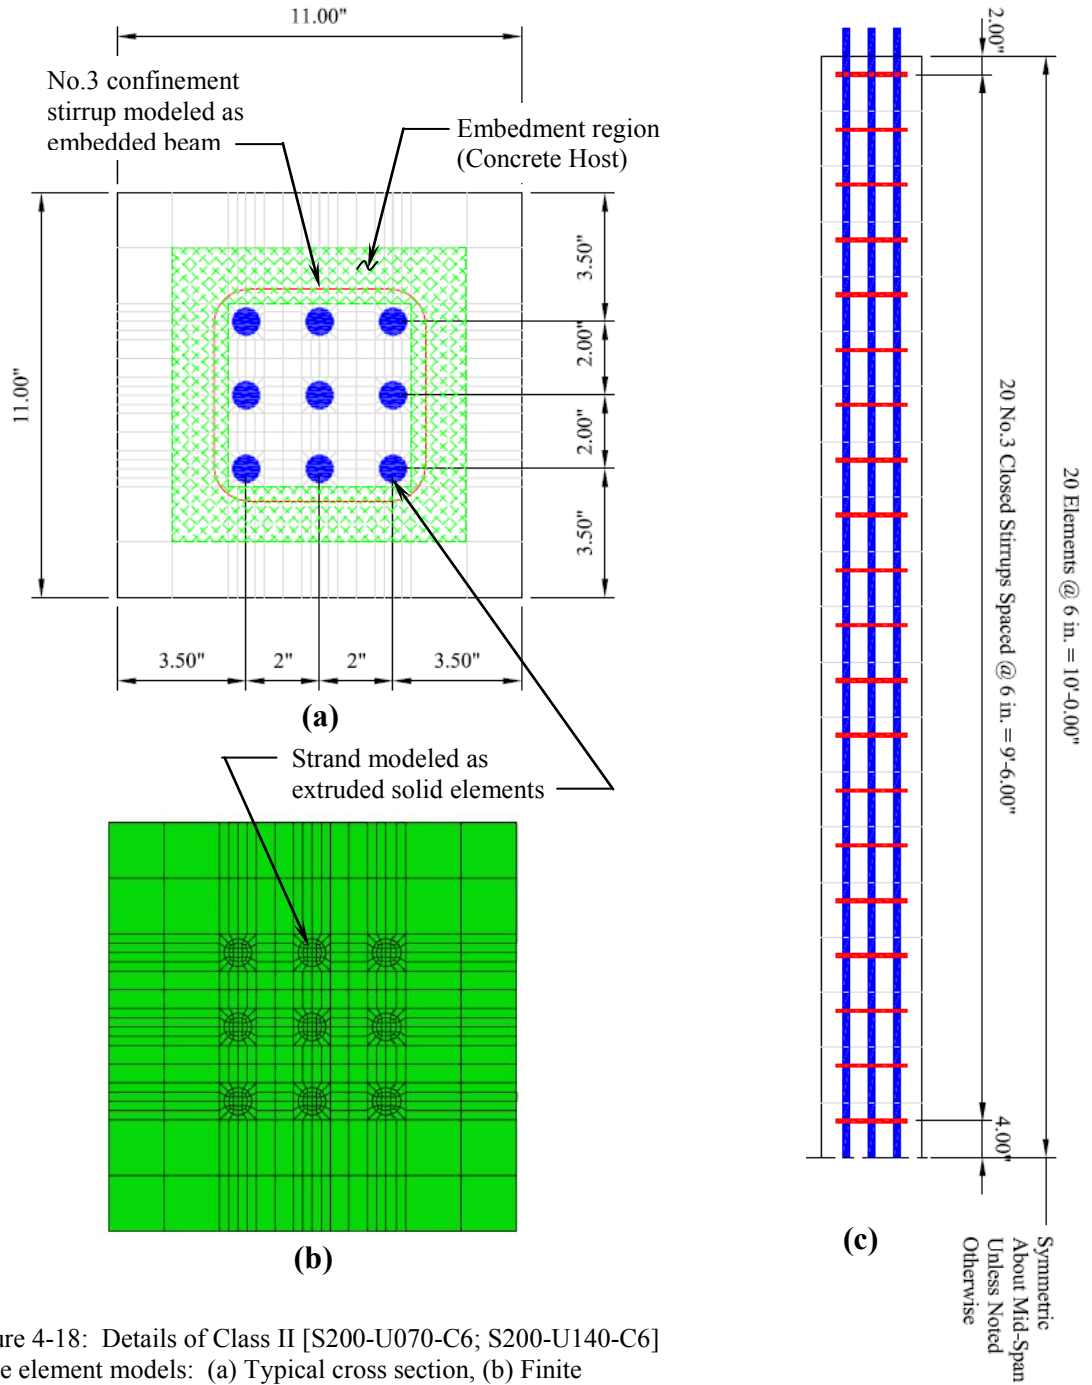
Details of Class II [S200-U070-C6; S200-U140-C6] finite element models: (a) Typical cross section, (b) Finite element simulation, and (c) Layout of confinement reinforcement (No.3 closed stirrups spaced at 6 in. on center)
